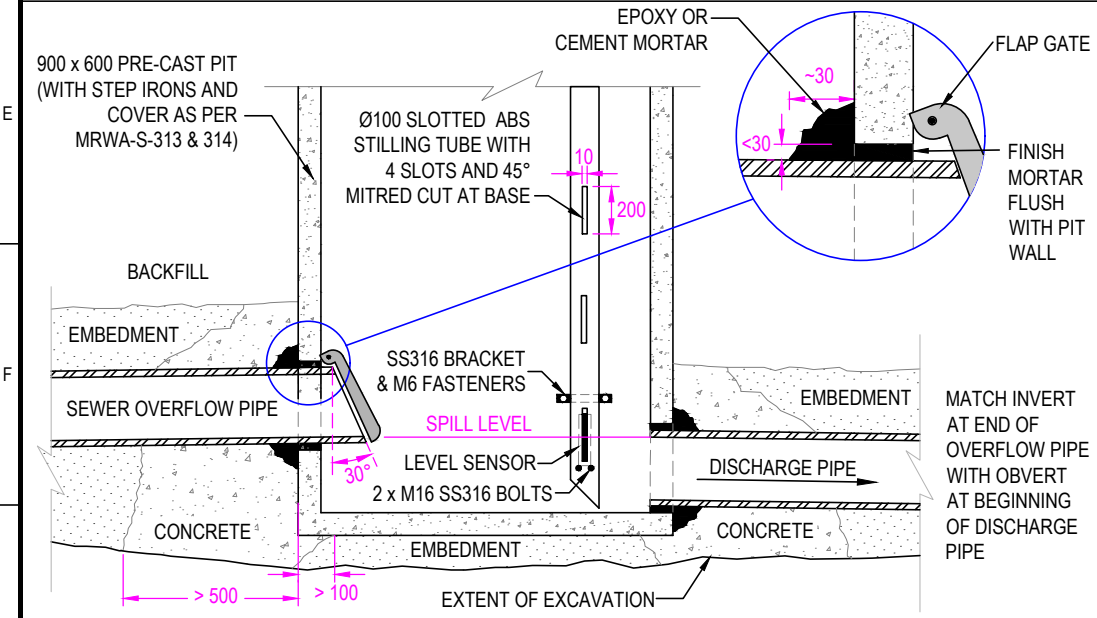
C: SEWER OVERFLOW MONITORING PIT
